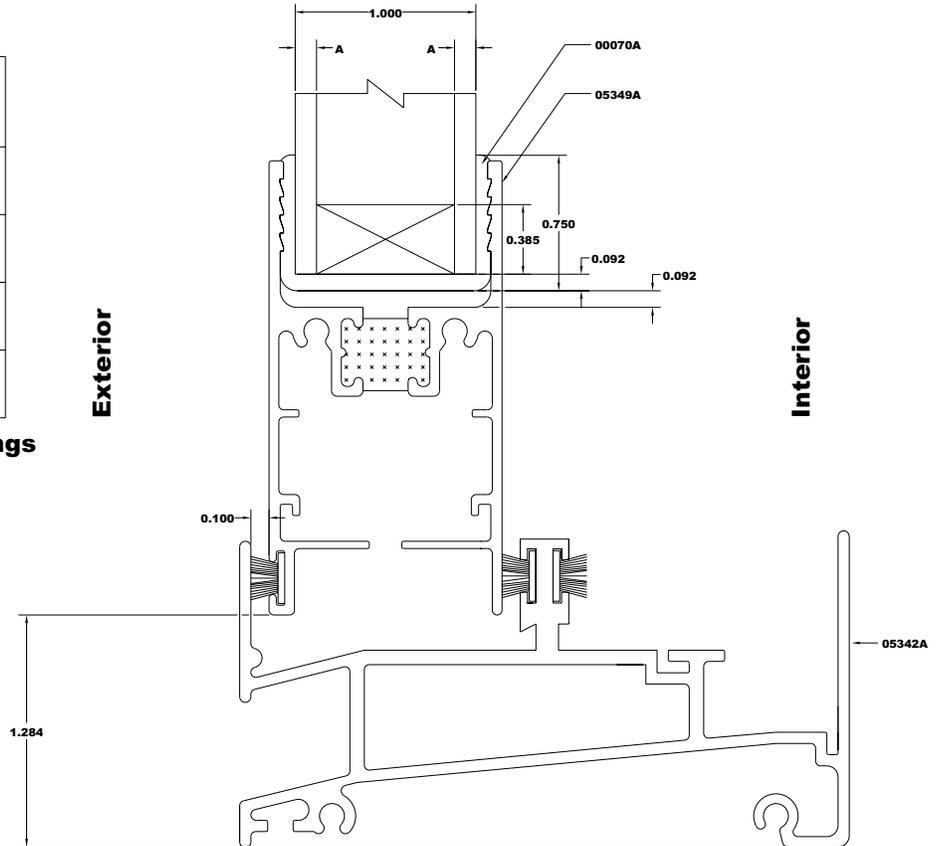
Fixed Sill Drawing for Horizontal Aluminum Slider.
